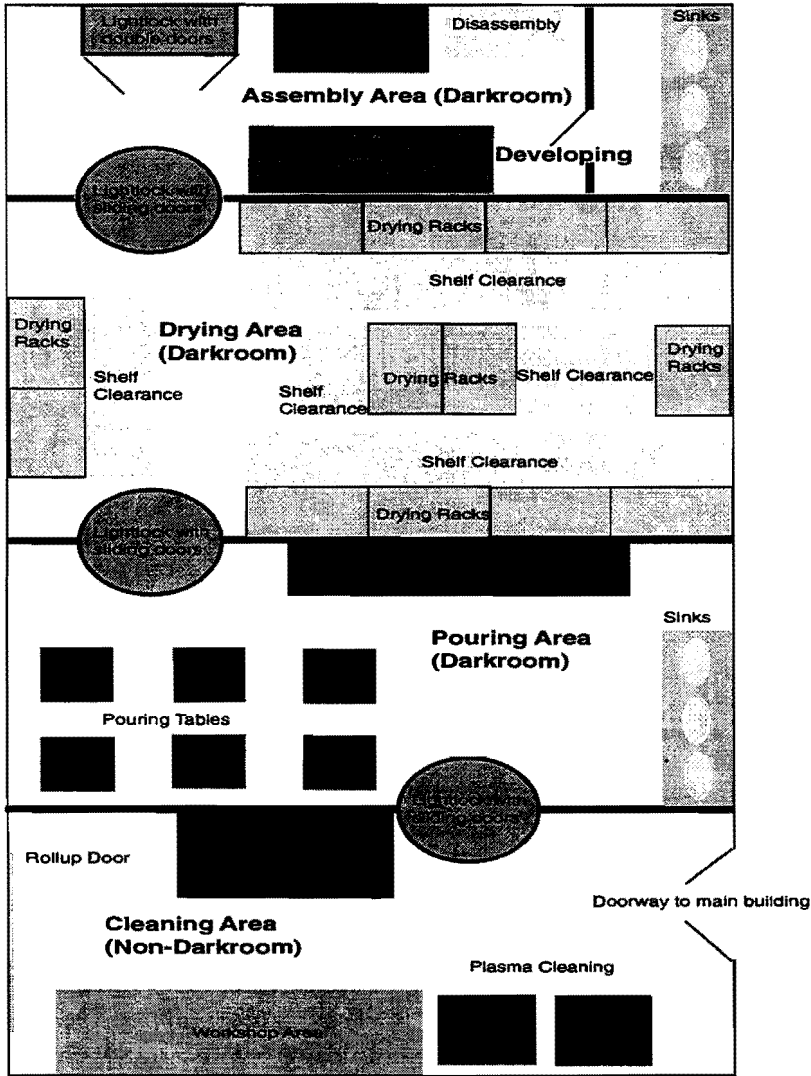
Floor plan of a possible emulsion modules production facility.
